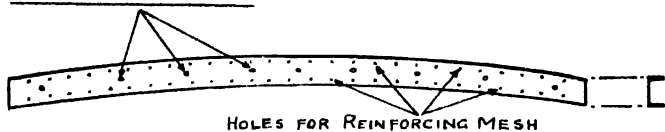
STEEL PROFILE, OR FORM FOR CAMBERED ROAD
